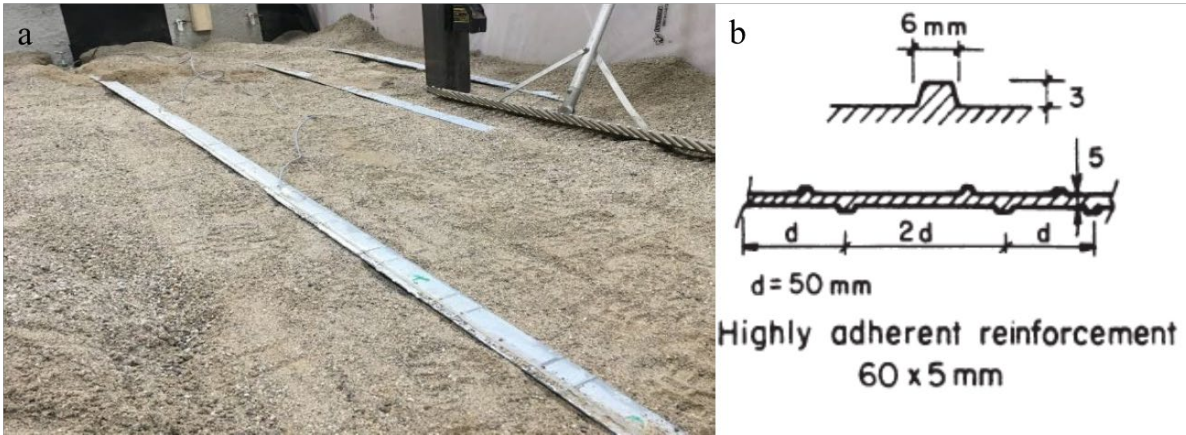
Steel strip (a) Located at first layer, (b) Detail of the friction elements (Fang,1990).
